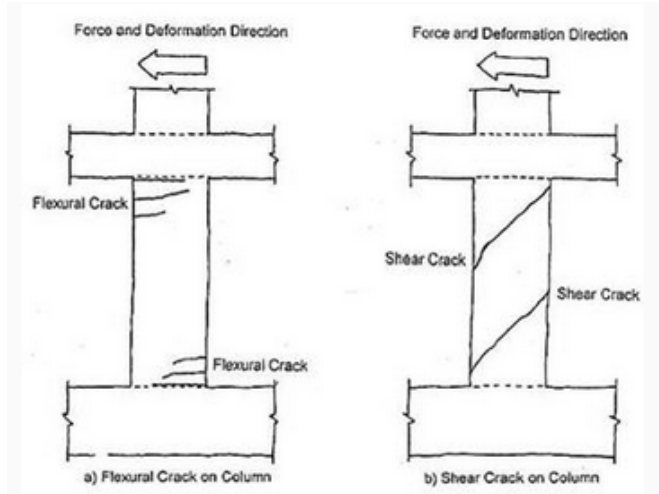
Example of Flexural (left) and Shear (Right) Failures in Columns
